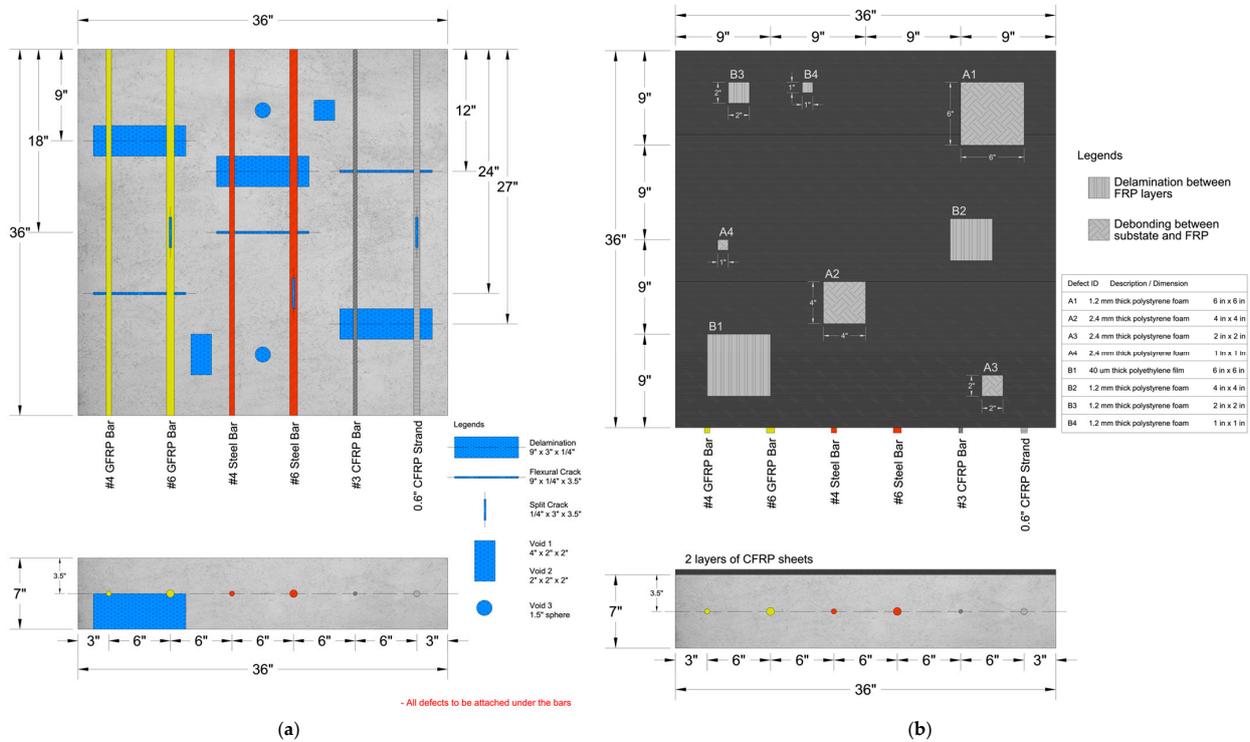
Slab Q', specimen defects within concrete and in the EB-FRP system. 1 in. = 25.4 mm. (a) Before EB-FRP system installation. (b) After EB-FRP system installation.
